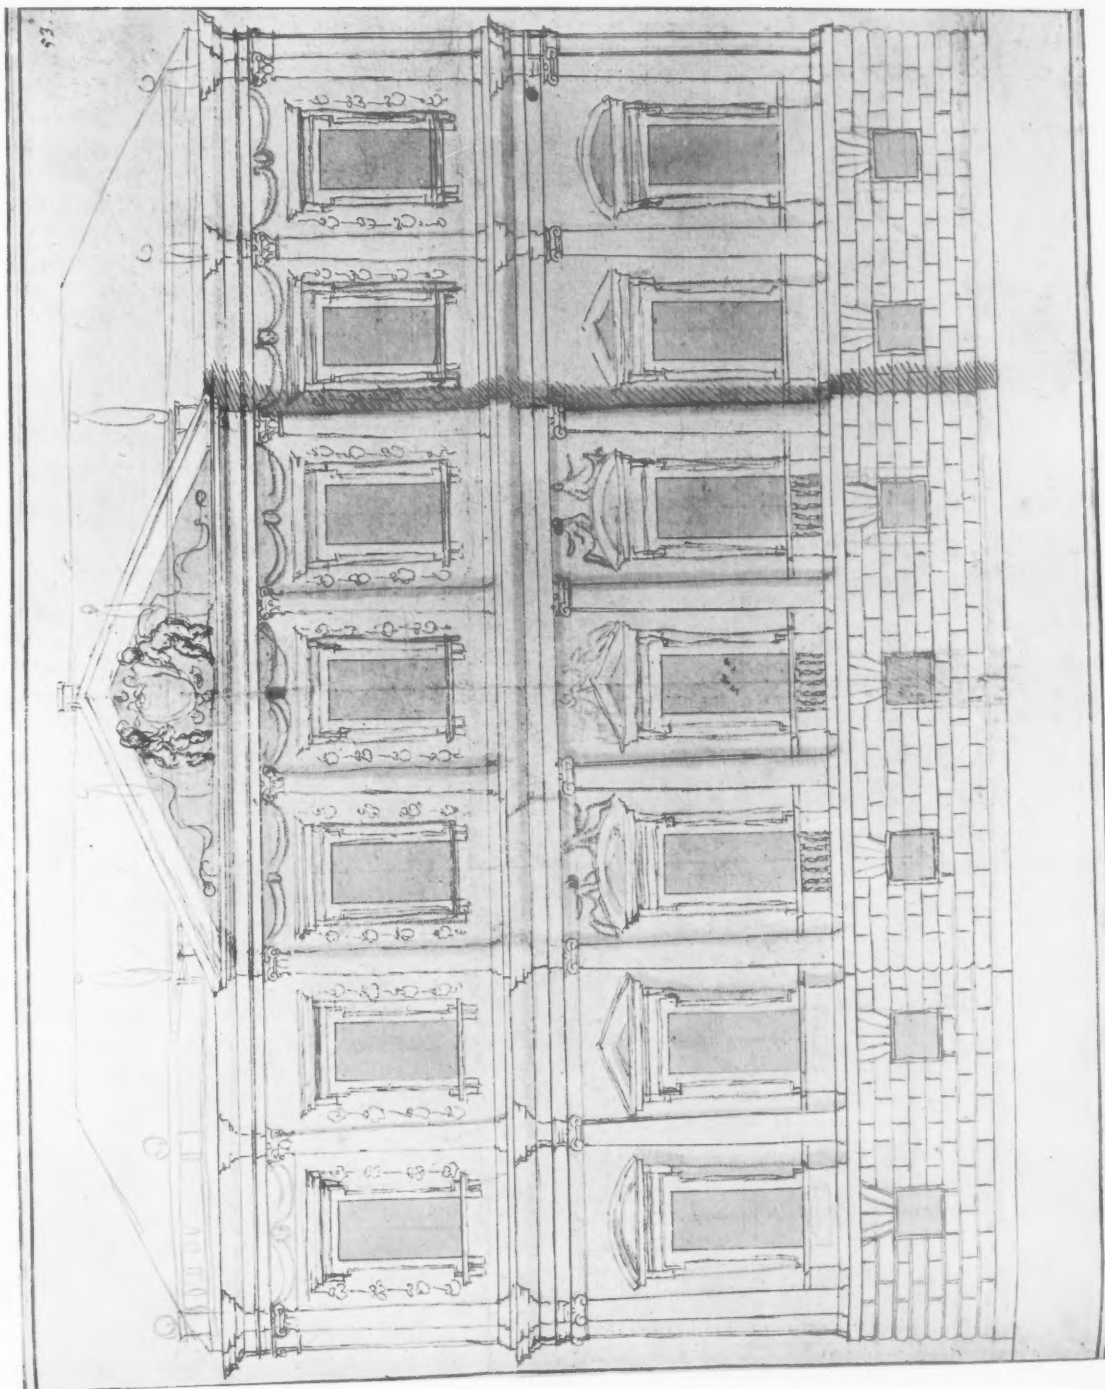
ELEVATION FOR THE EXISTING BANQUETING HOUSE BY INIGO JONES
